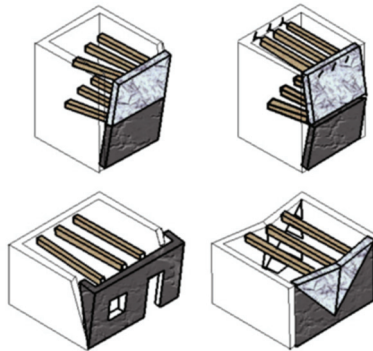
Wall overturning modes due to an inadequate stiffness of the floor (redrawn from:[20])
